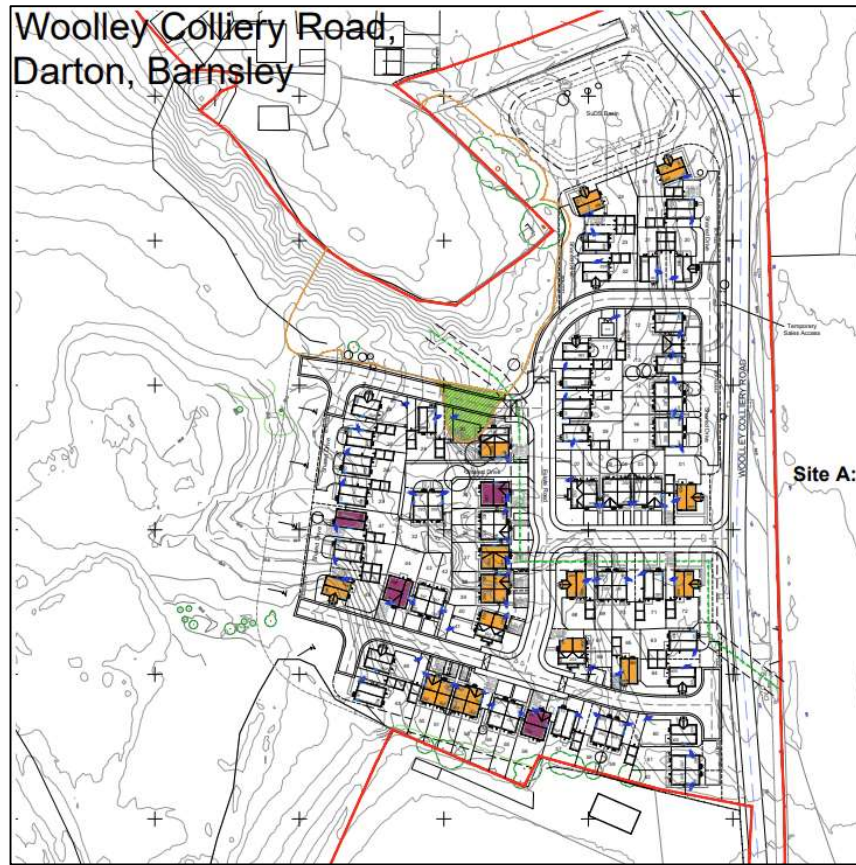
Northern Site - Proposed site plan NTS (Source: PRA Architecture Proposed Sketch Layout, dated 31.07.2024)
